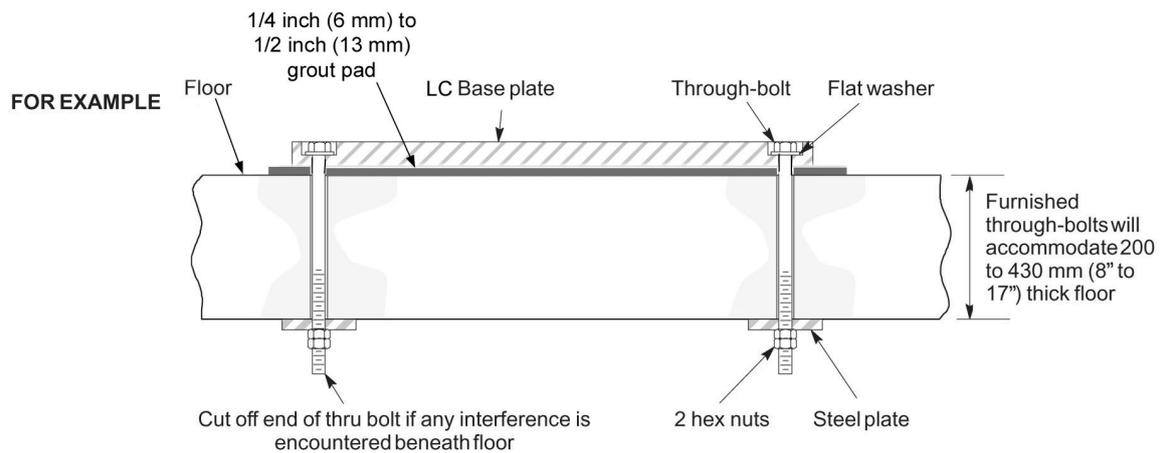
Through-Bolt Supplied (Slab Type Floor Construction)
